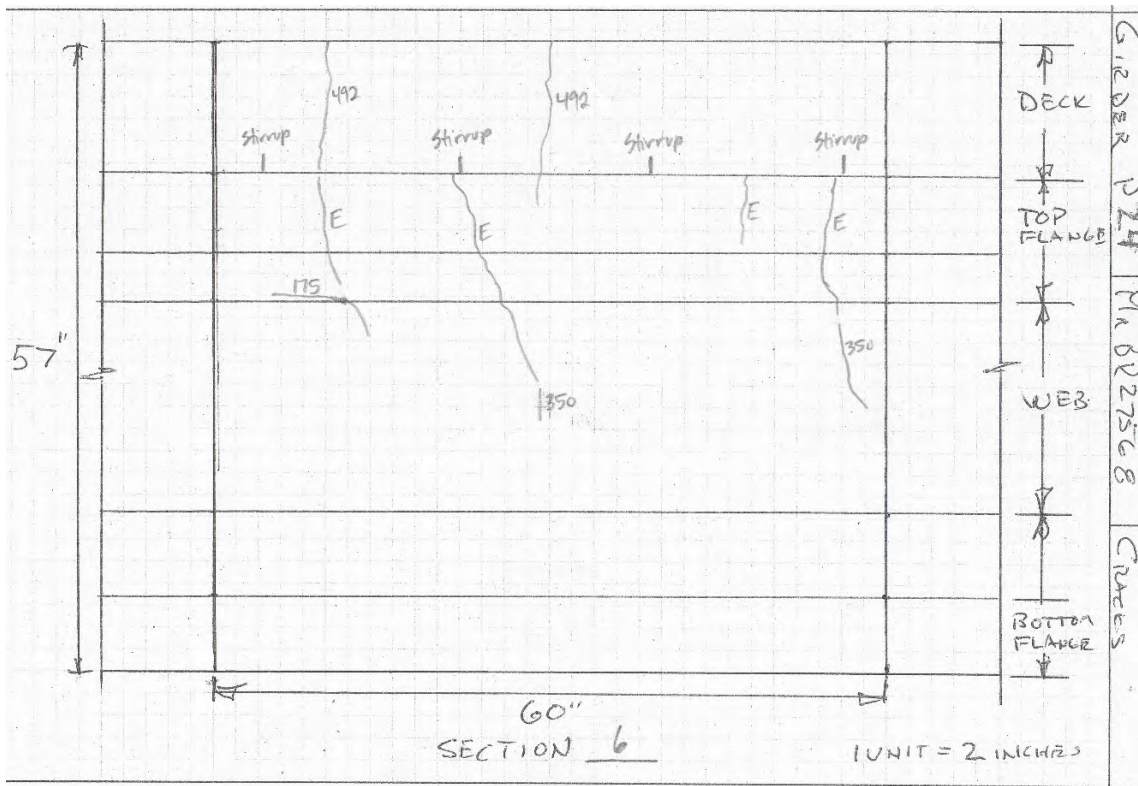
Girder P24 crack pattern – Section 6
